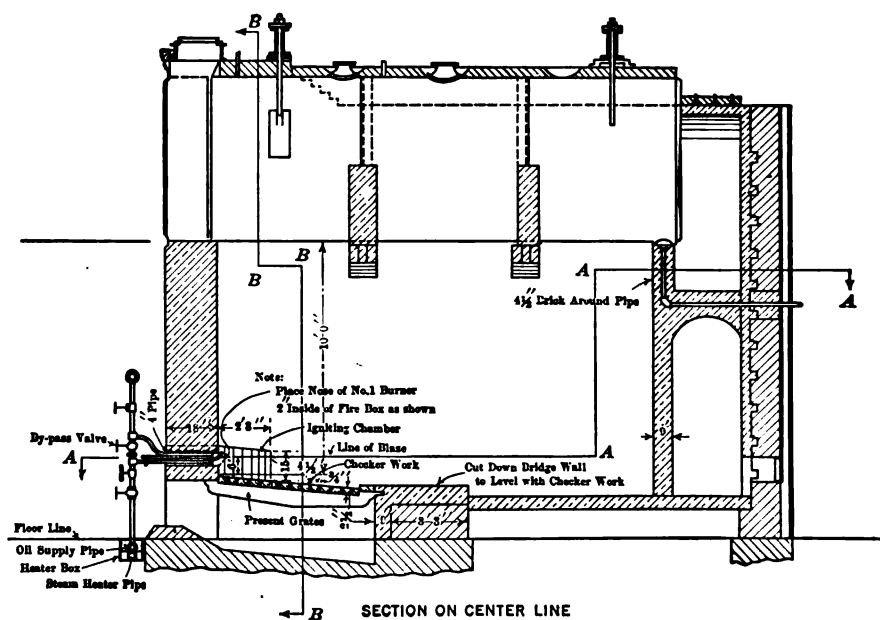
Return tubular boiler, high setting, which is recommended when placing a new boiler.
